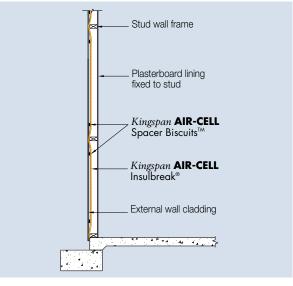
Side elevation of *Kingspan* AIR-CELL Insulbreak[®] on steel-framed wall
